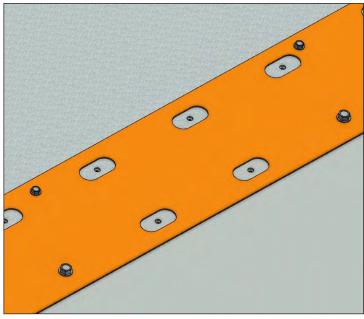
Top Perimeter Guardrail Gap Plate Attachment
